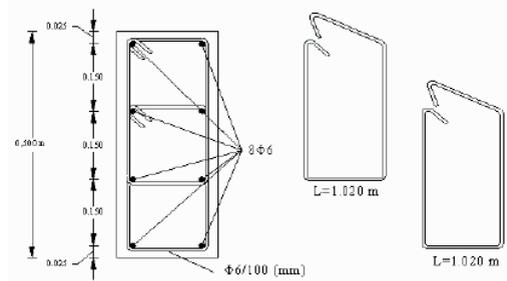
Dimensions and reinforcing details of Volvi pier cross-section (Models A1, A2 and B1)
